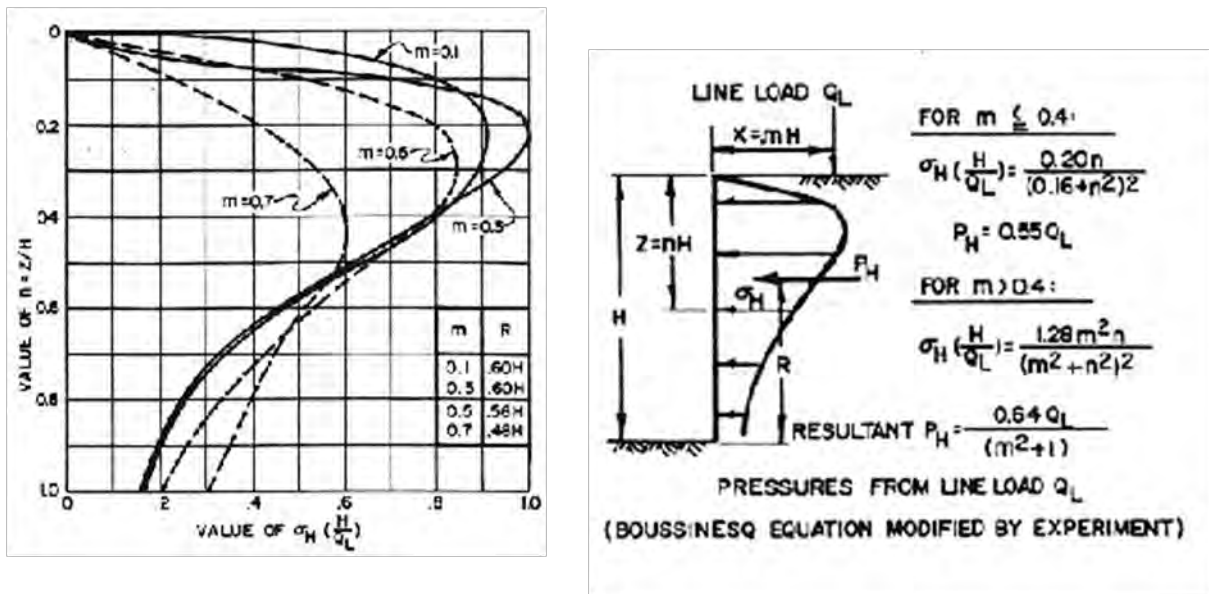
Pressure on Foundation Wall Due to a Surface Line Load
